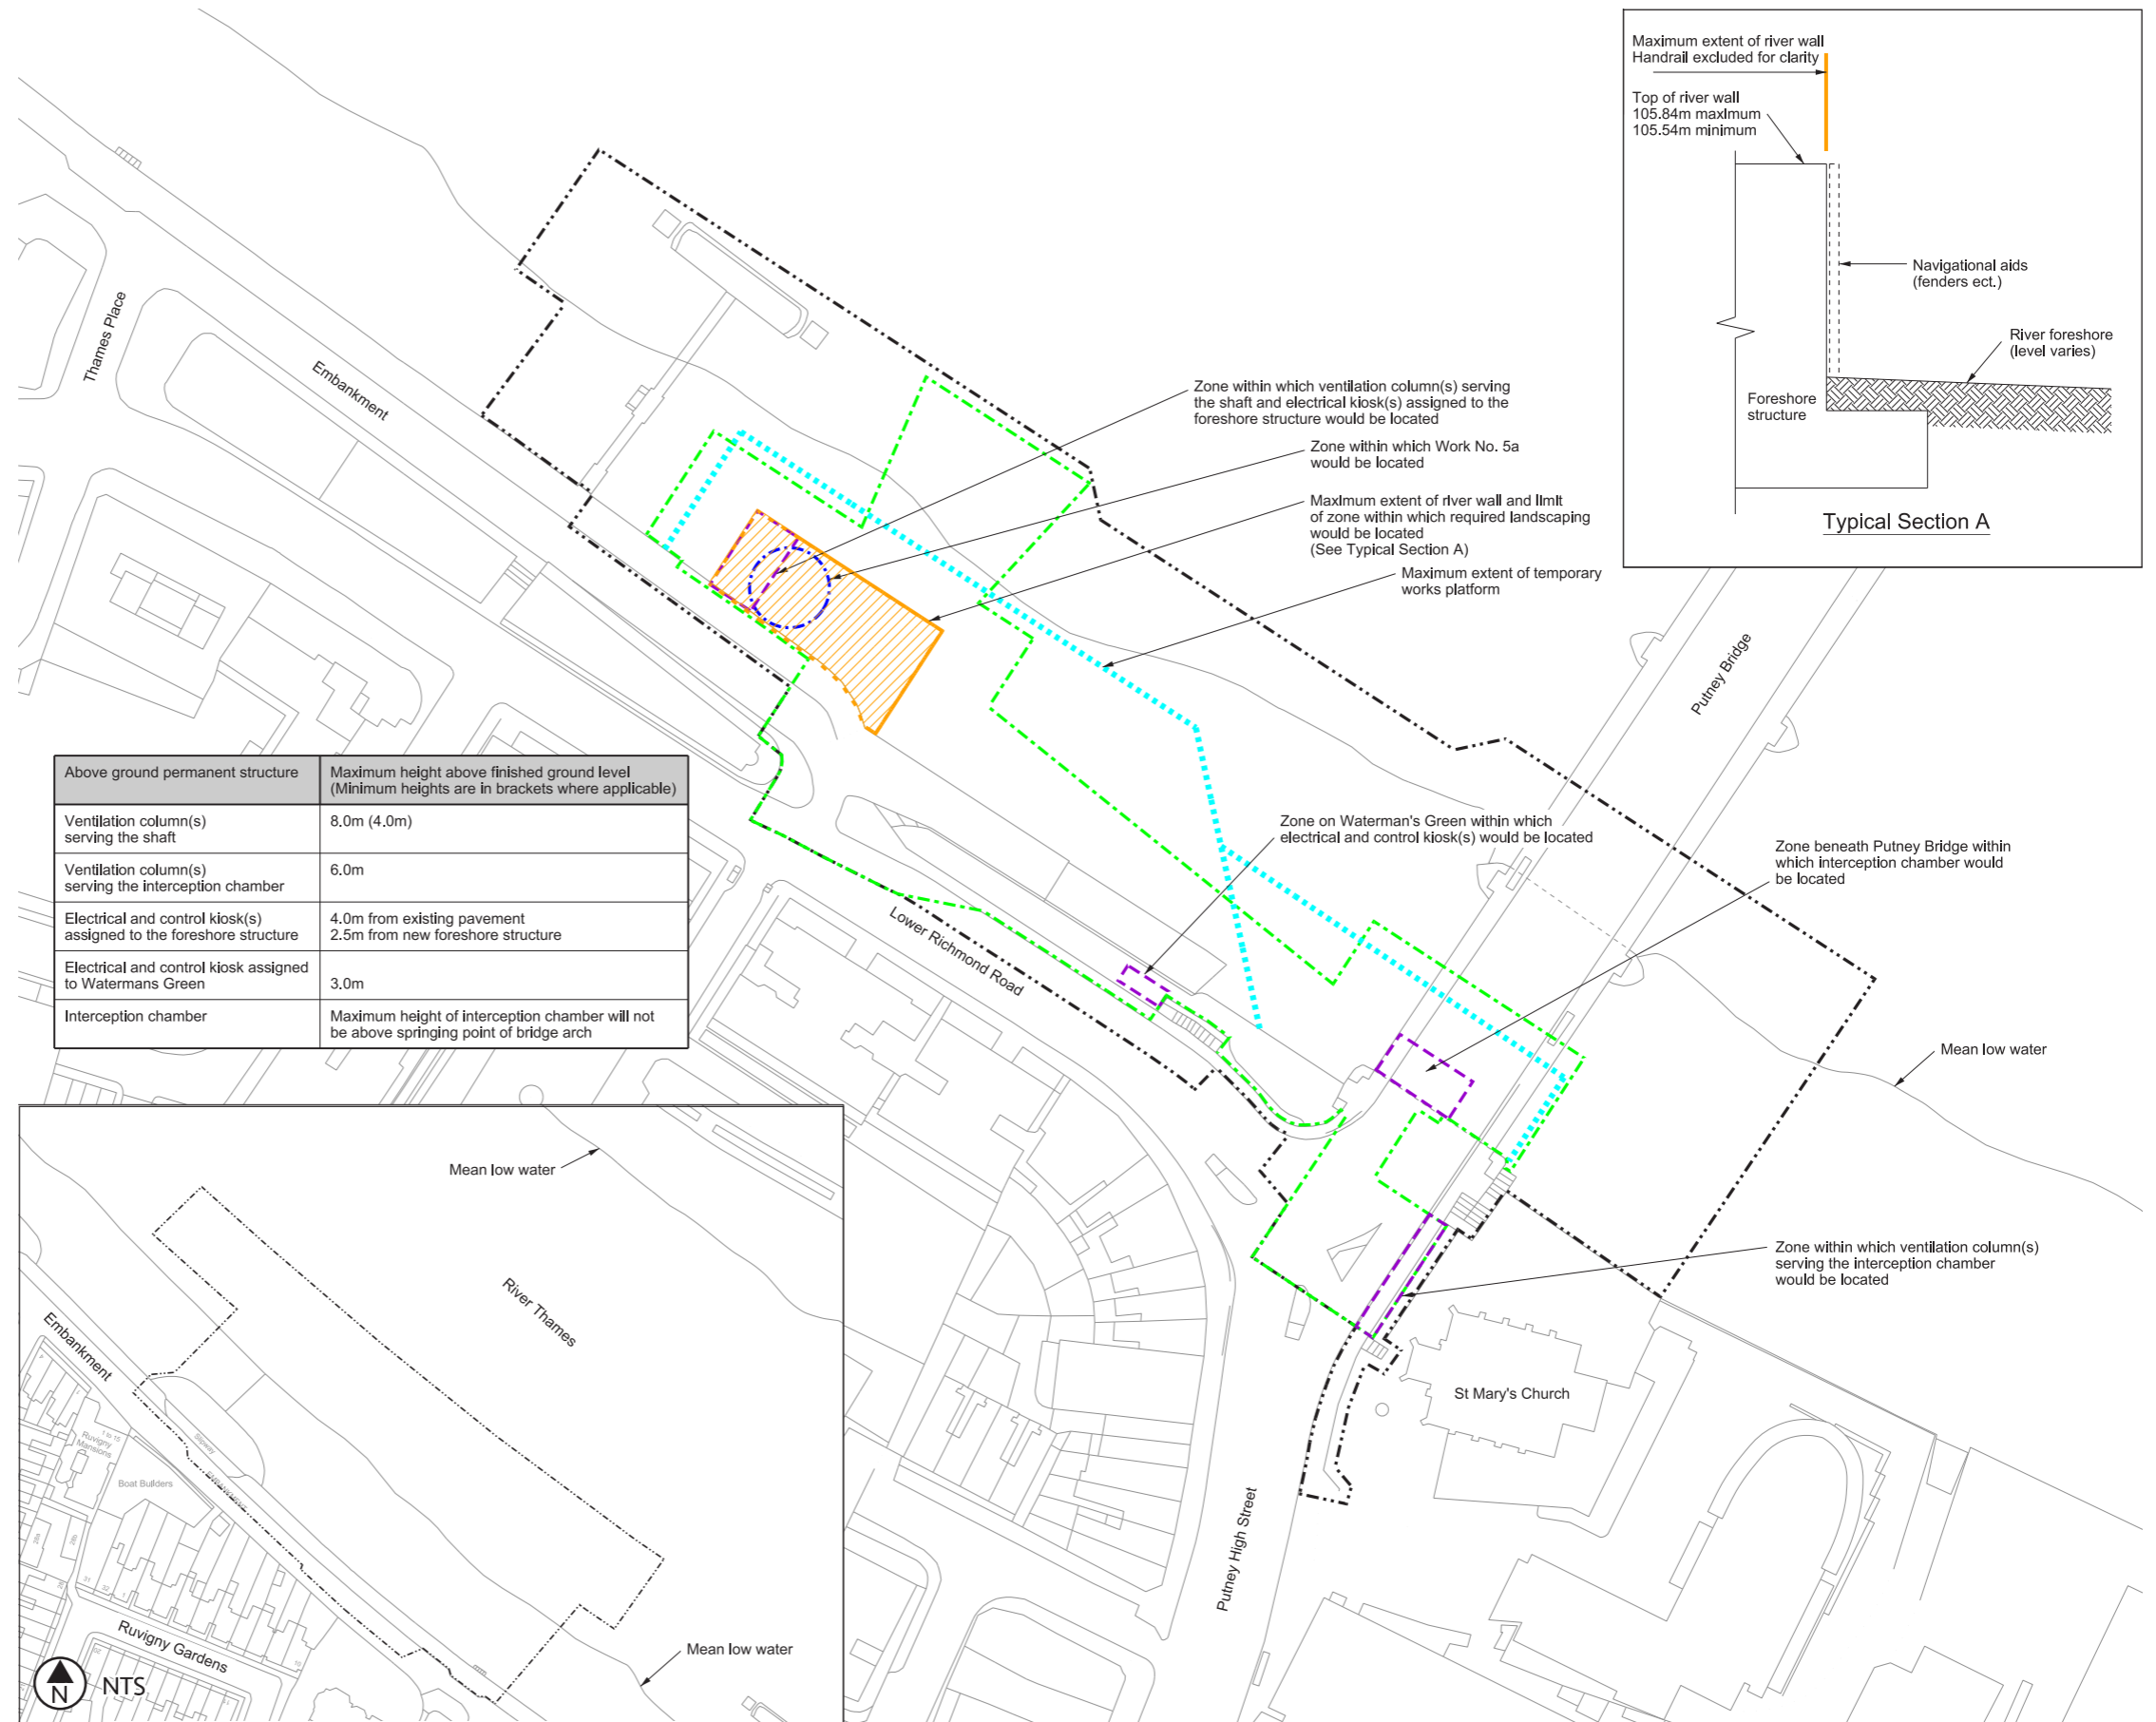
Site works parameter plan - refer to Site works parameter plan in the *Book of Plans
